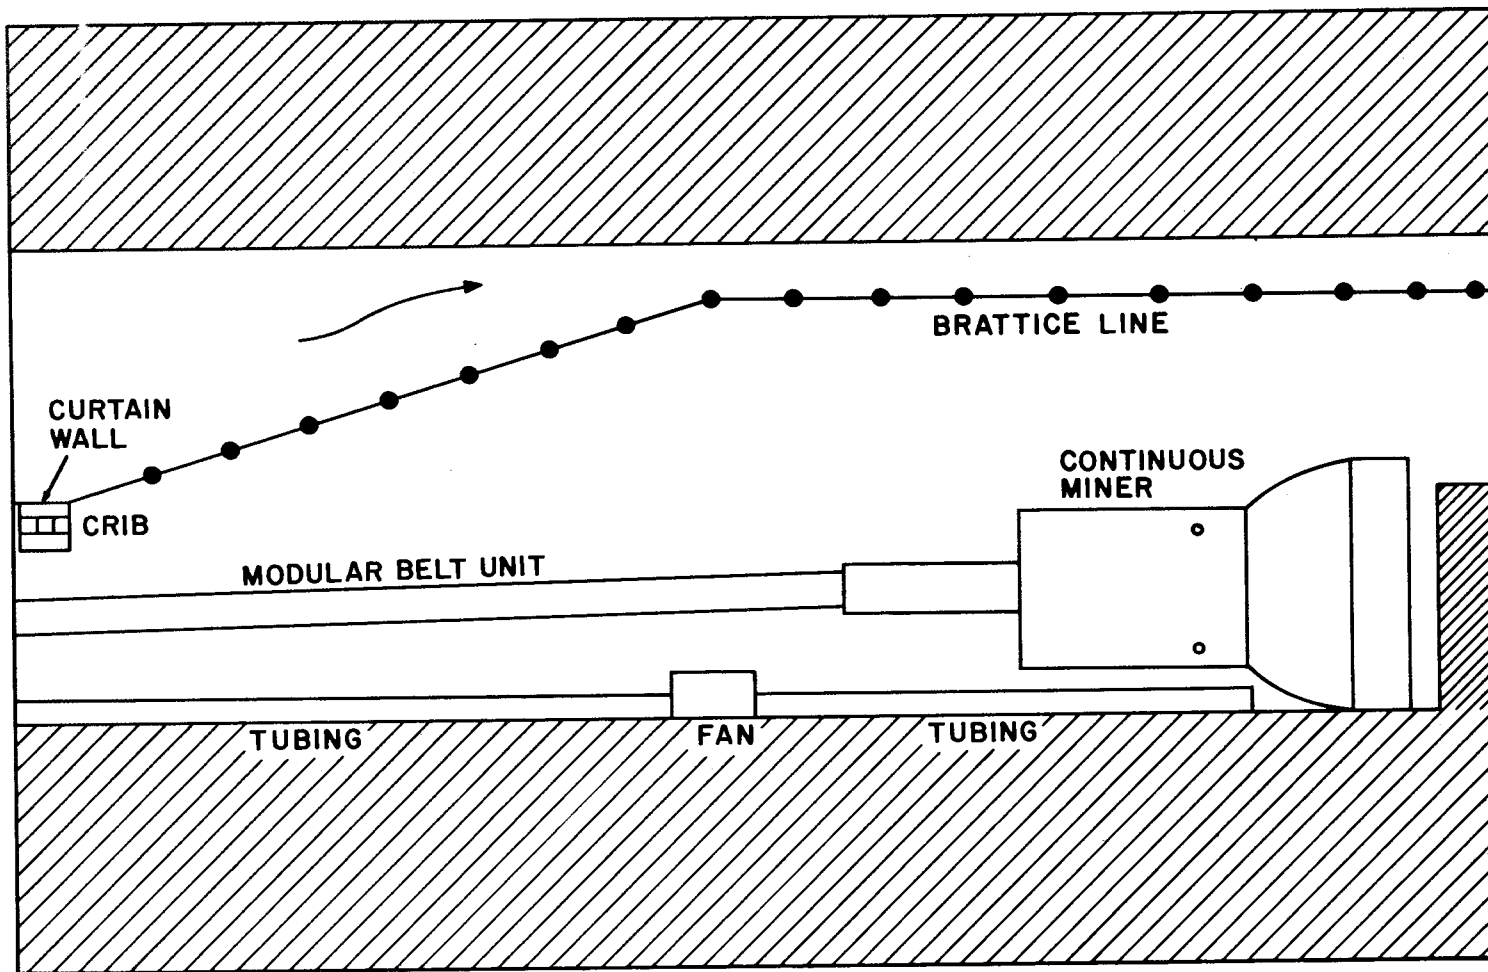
PLAN VIEW OF THE FACE AREA DURING THE DEVELOPMENT OF THE SINGLE ENTRY
